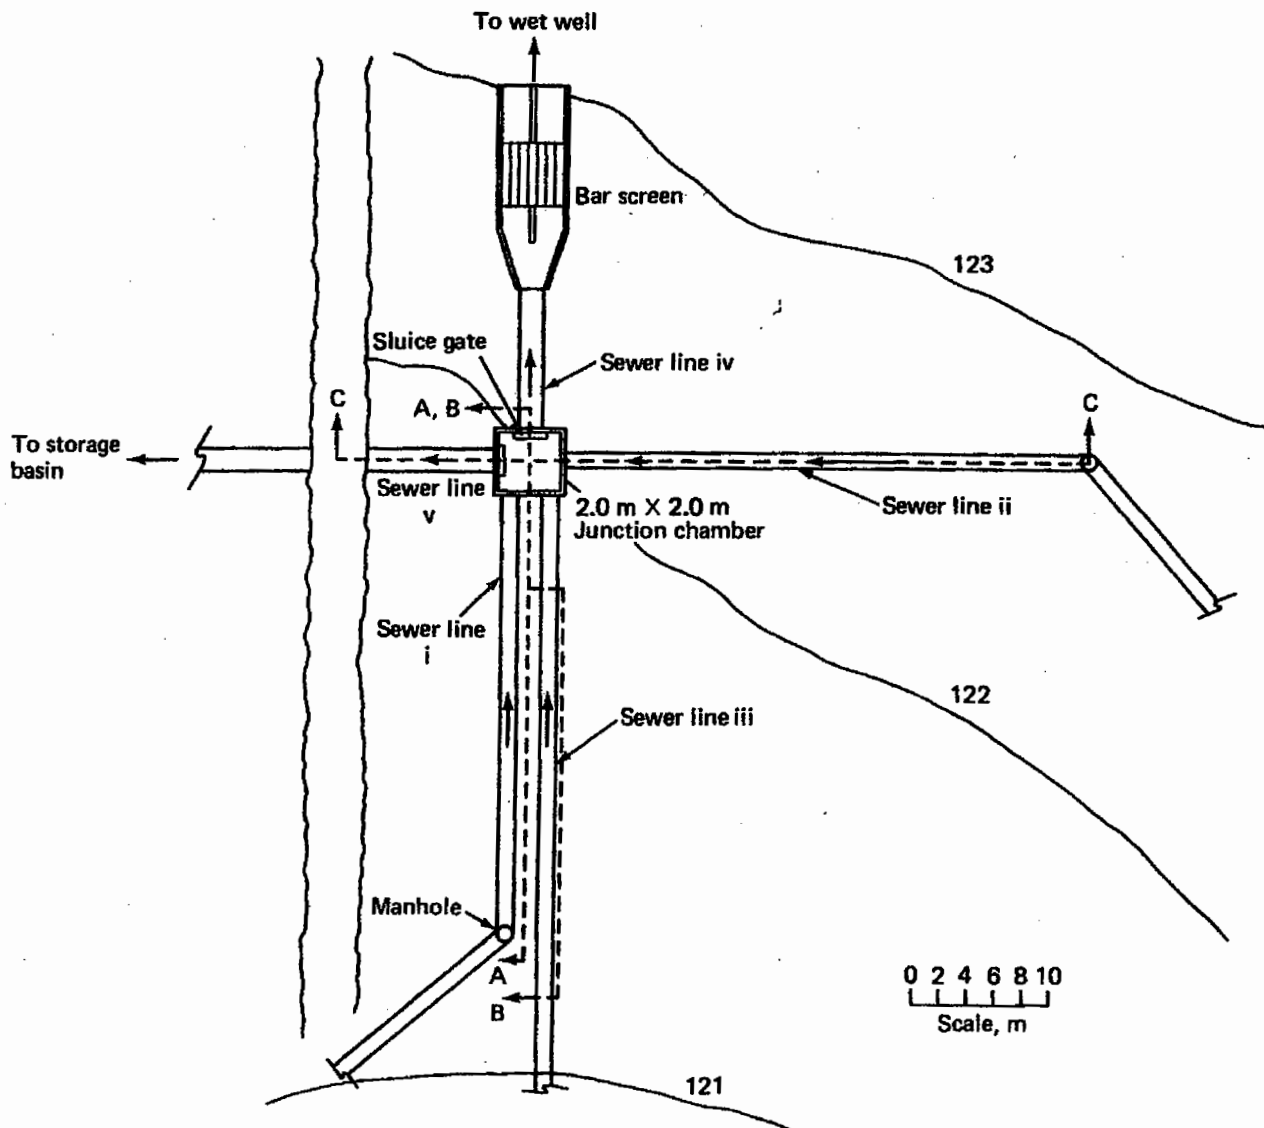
Sewer Layout for Design Example (see Tables 7-5 and 7-6 for sewer line identification number and details).
